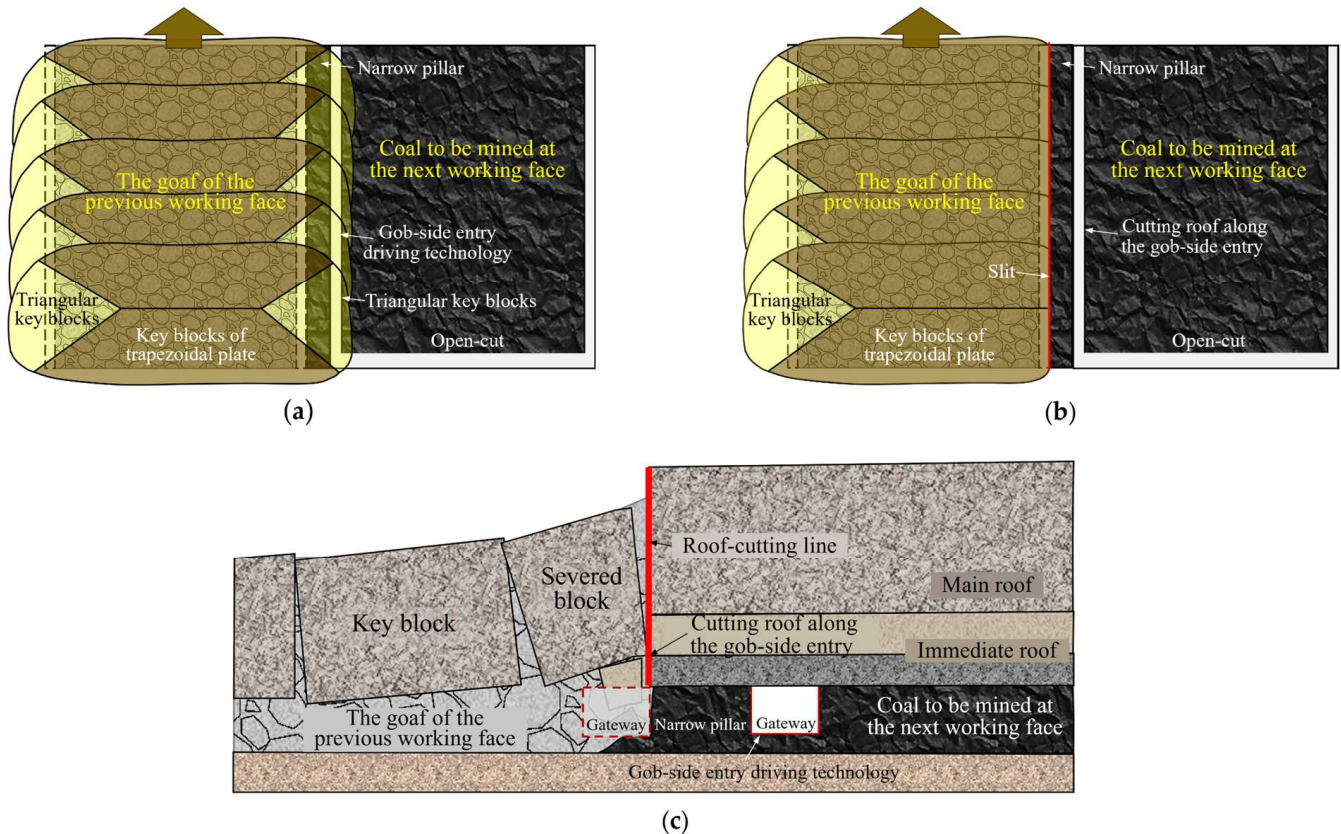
The schematic diagram of roof-cutting for gob-side entry driving. (a) Roof structure without roof cutting (b) Roof structure after roof cutting (c) Cutting roof and unloading the pressure along the gob-side entry.
